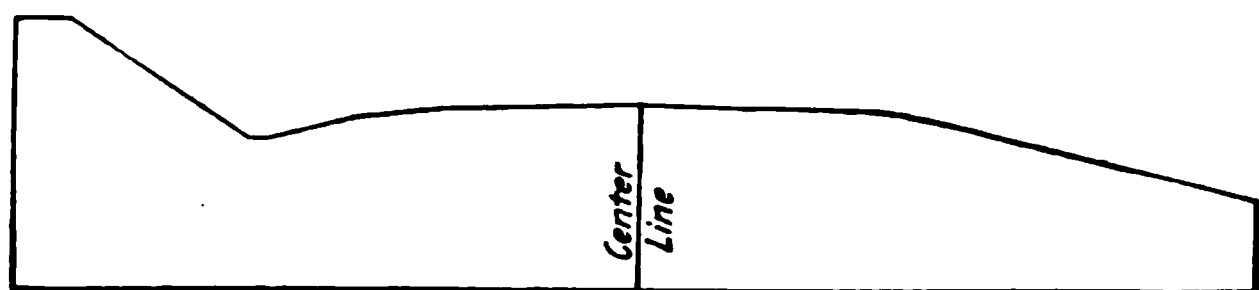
Transparent Templet for Use on Cross-Sections Giving Finished Shape of Road
